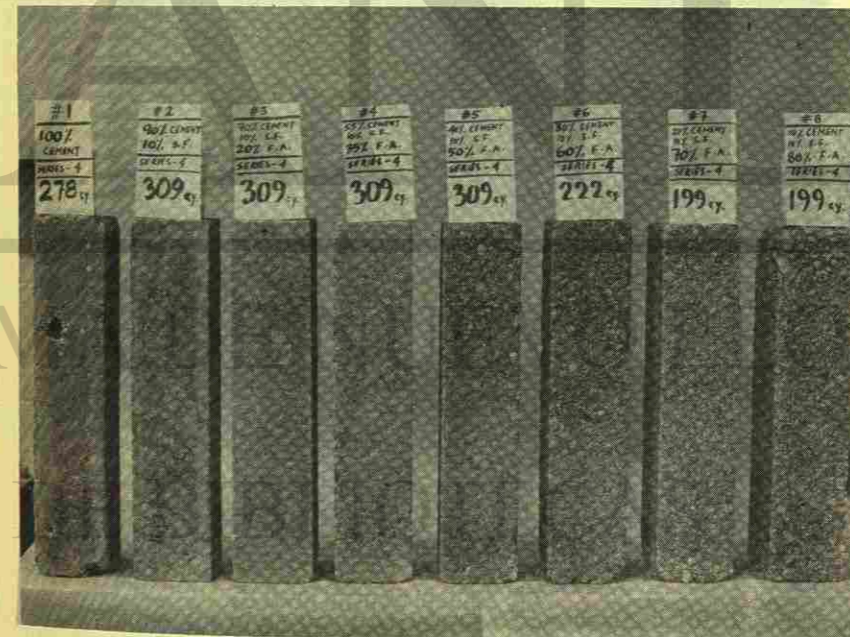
Non air-entrained Concrete specimens after the Freezing and thawing test.
